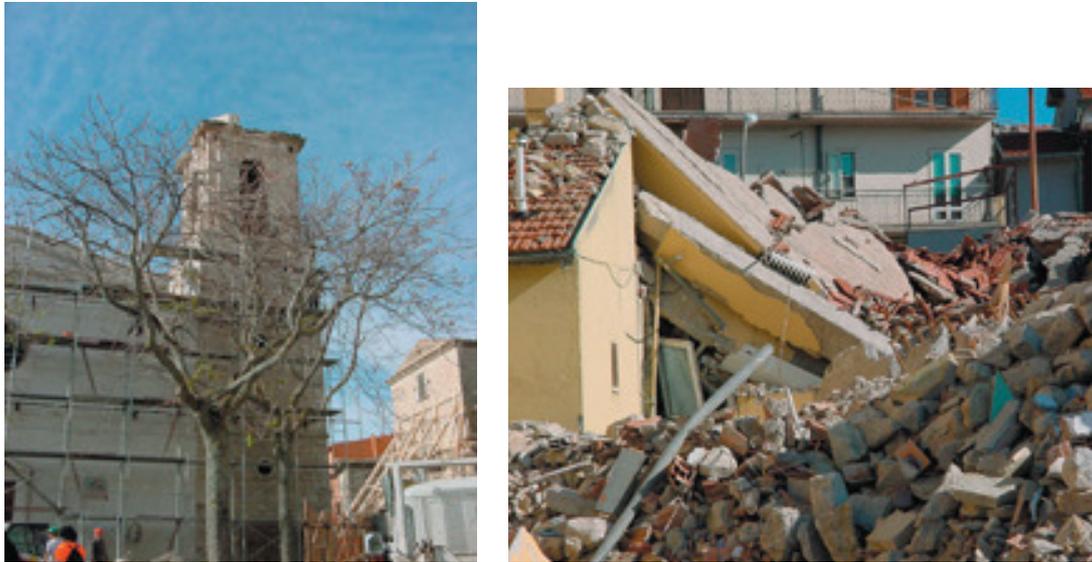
LEFT) San Giacomo Church; the spire of the bell tower which was recently reconstructed in reinforced concrete has collapsed, original unreinforced masonry bell tower left undamaged RIGHT) collapsed school in San Giacomo, visible: heavy concrete slab of second floor was supported by the now collapsed poor quality stone masonry units[3]
